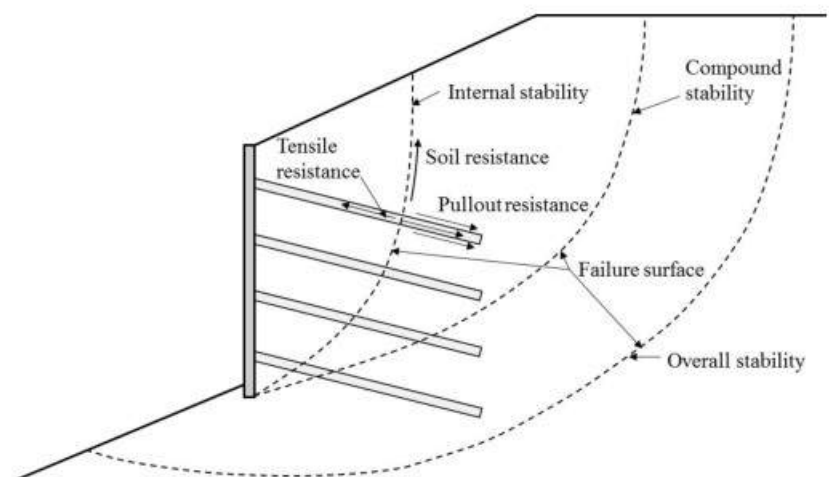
Failure Modes in Soil Nail Walls
